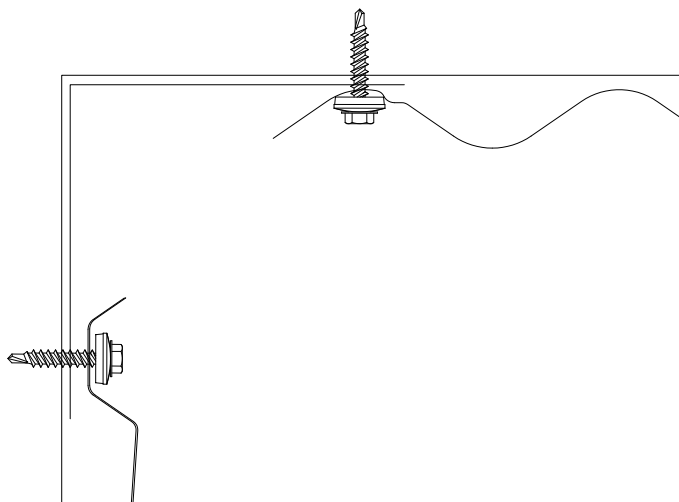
Internal corner flashing. Wall sheets for vertical installation.
